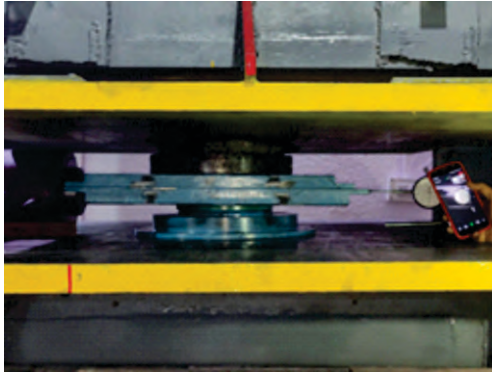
Vertical and Hor Load Test on spherical Bearing.
